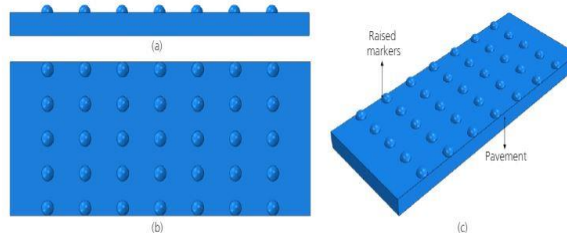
Raised pavement marker-based musical road: (a) elevation; (b) plan; (c) 3D view
